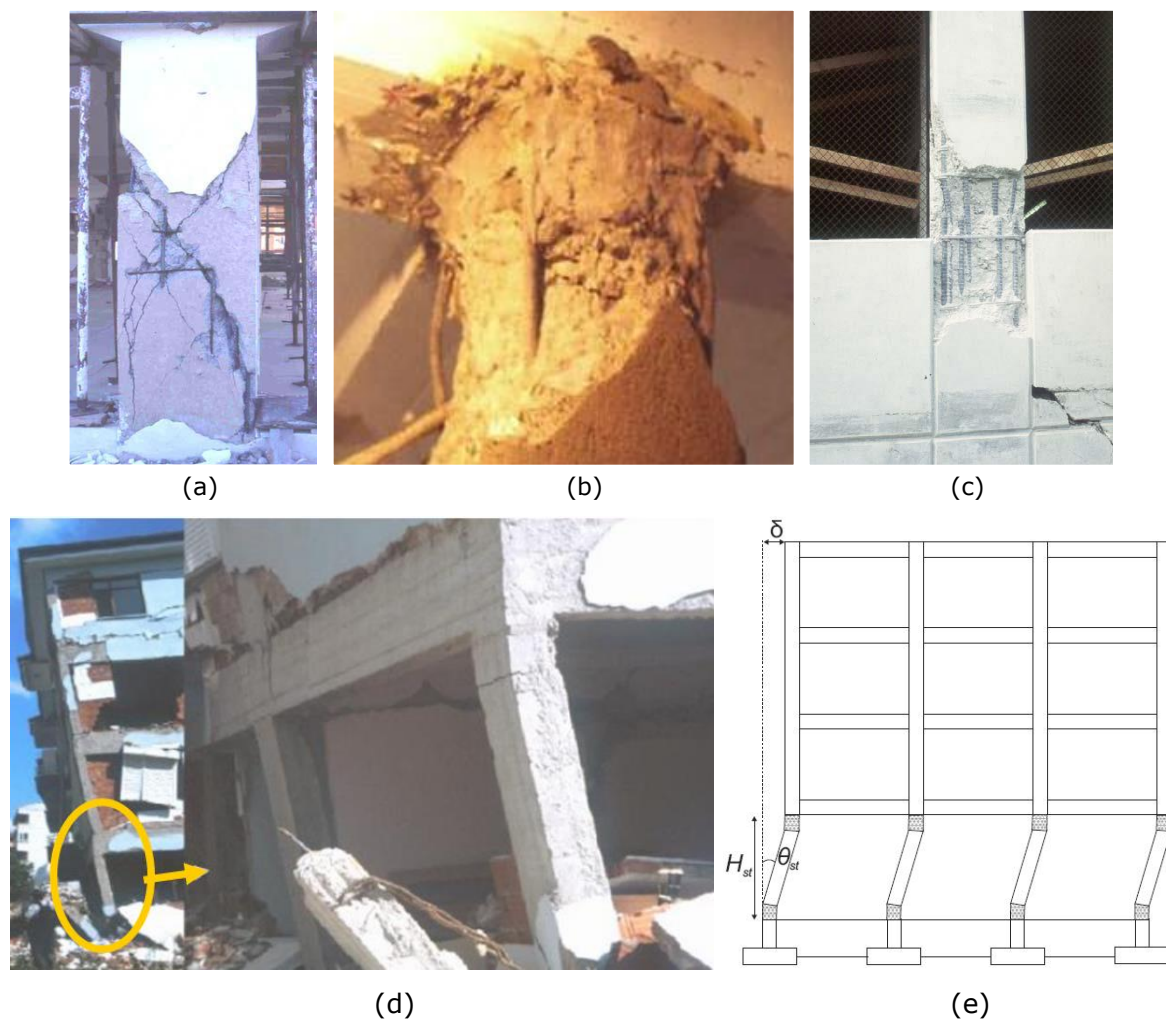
Typical failure of RC columns after earthquakes: (a) Shear failure; (b) Bar buckling; (c) loss of bond at short lap-splices; (d-e) flexural failure in a “*weak column-strong beam*” situations.
